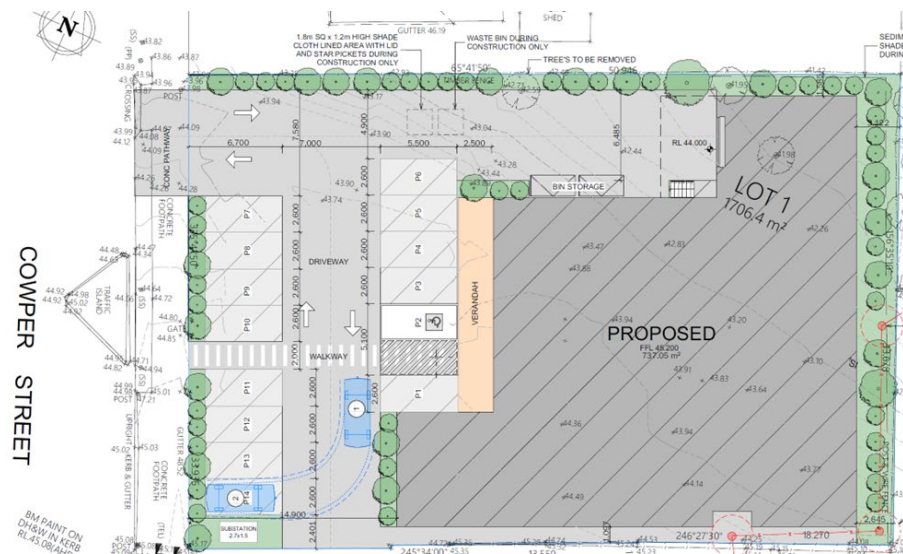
Proposed Site Plan (Source – Sorensen Design and Planning)
